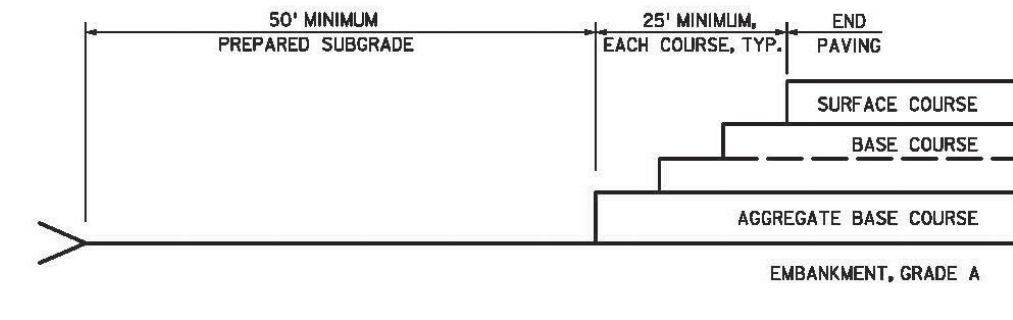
Parkway New Pavement Interface with Existing Pavement
